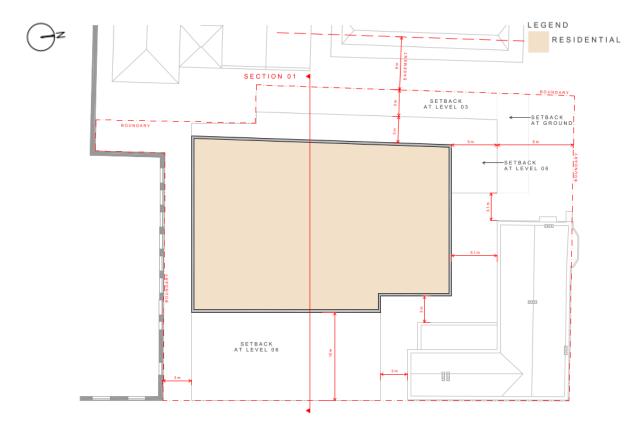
Proposed maximum envelope plan of levels 6 to 15
